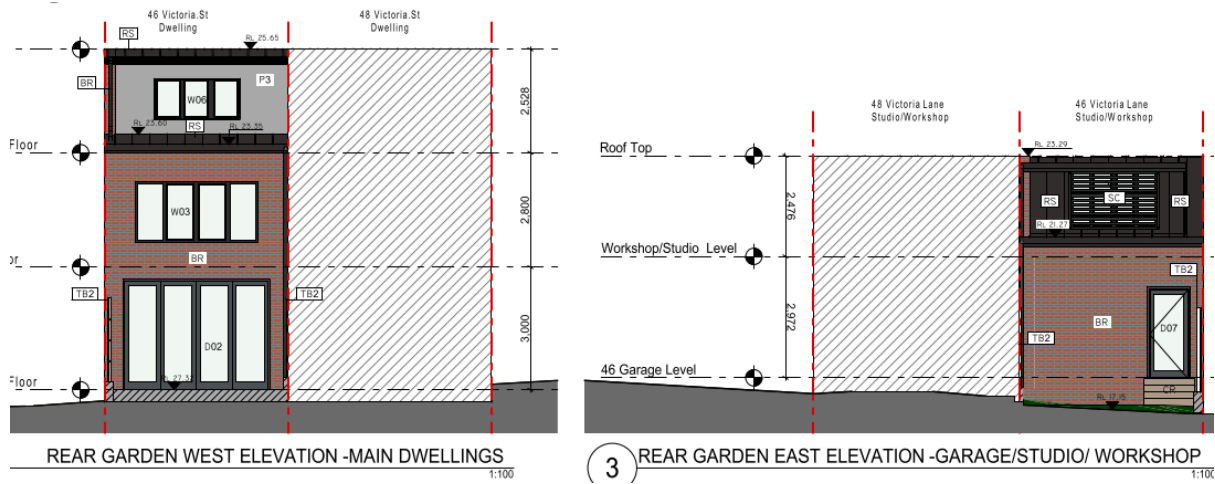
West elevation plan (dwelling) and east elevation (garage/studio) viewed from rear yard
